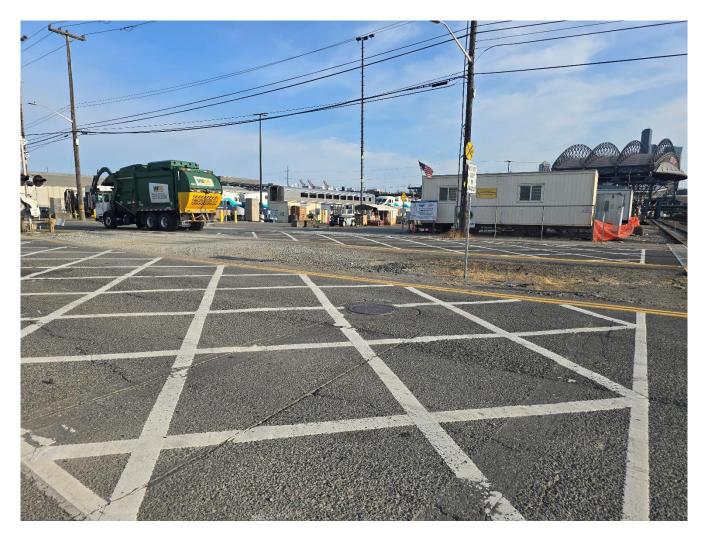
S HOLGATE ST BETWEEN DOT# 085583Y AND 927461X CROSSING, PAVEMENT CONDITION SHOWING ALIGATORING AND TRENCH REPAIR, SW CORNER LOOKING NW
